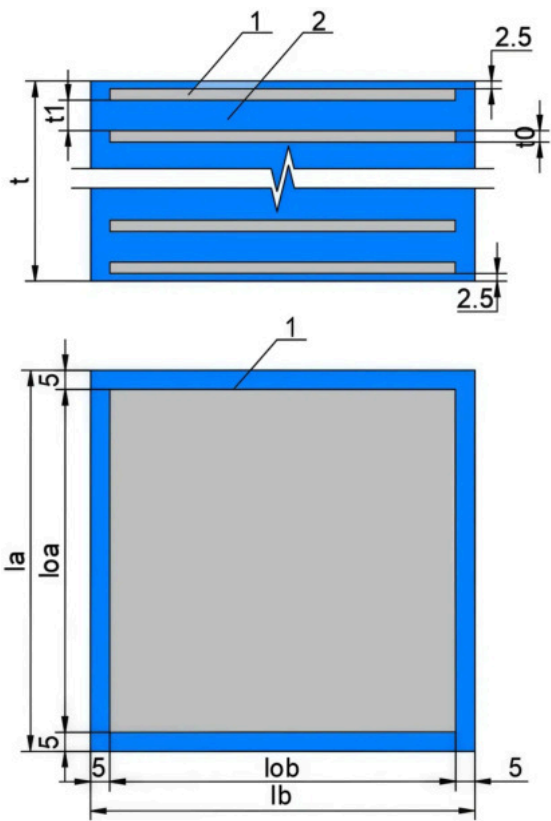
Structure of a Rectangular Laminated Elastomeric Bearing (Unit: mm) | 1 - Steel Reinforcement Layer; 2 - Elastomer Layer
